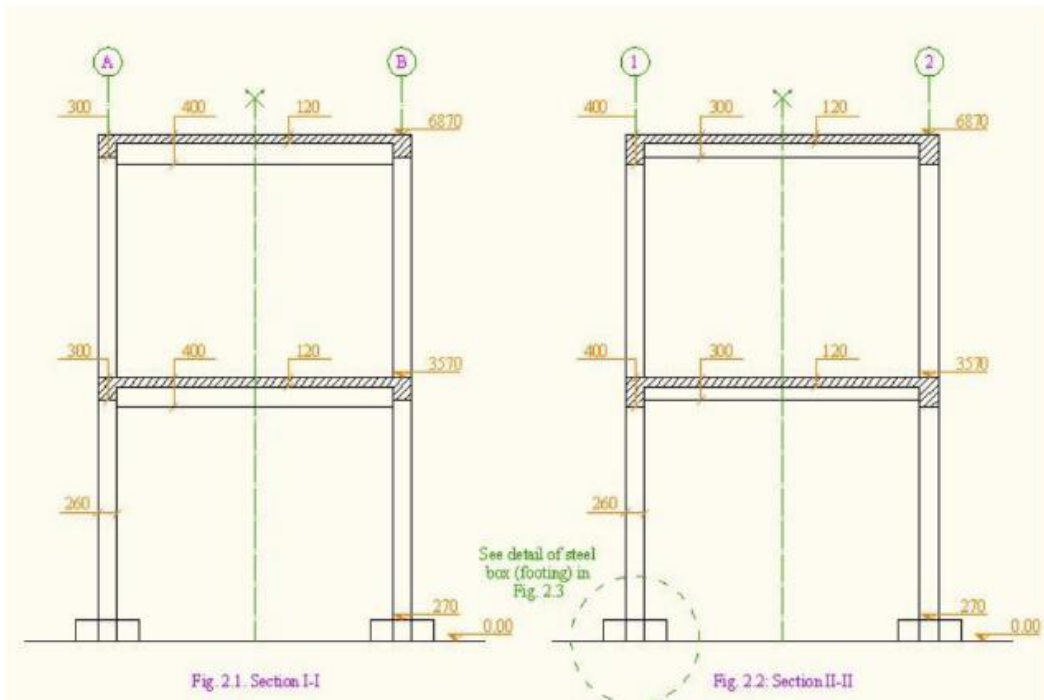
BANDIT specimen elevation (Unit: mm), (Garcia et al. 2012)
